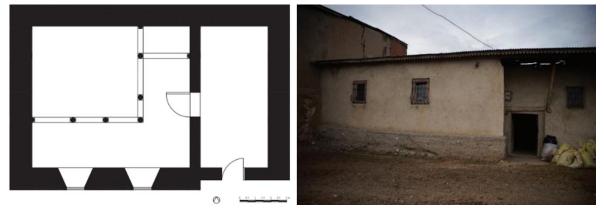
Sivas İlbeyli Çallı Village Ümmet Ağa's Room Left: Plan of the Room, Right: Entrance of the Room Seen from Outside (Bulut, 2017, pp. 13-31).
